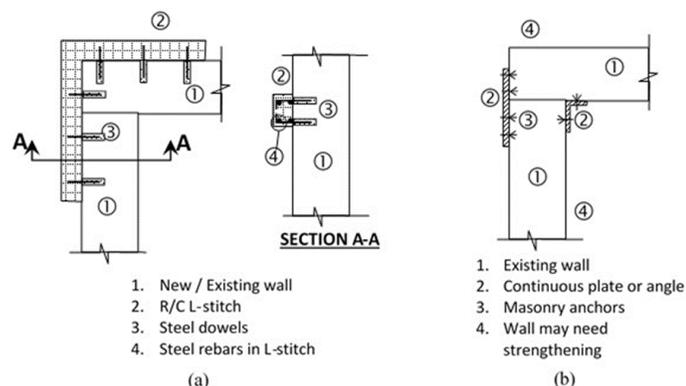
Improving connection between walls. (a) L-stitch in new construction, (b) Continuity element for existing construction
